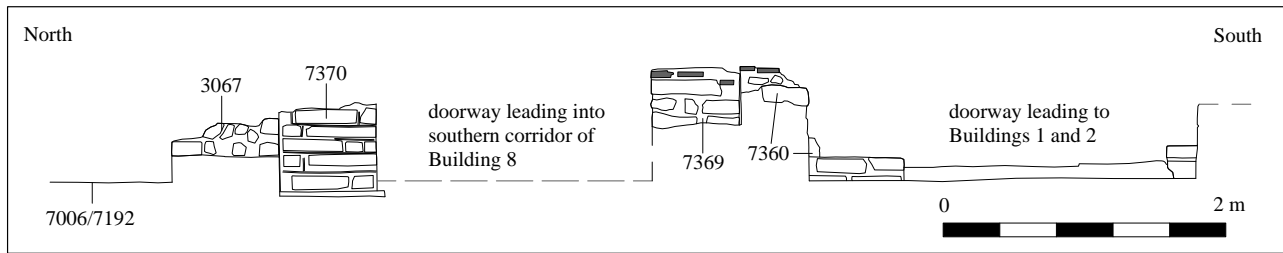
West-facing elevation of the doorway leading into the southern corridor of Building 8
